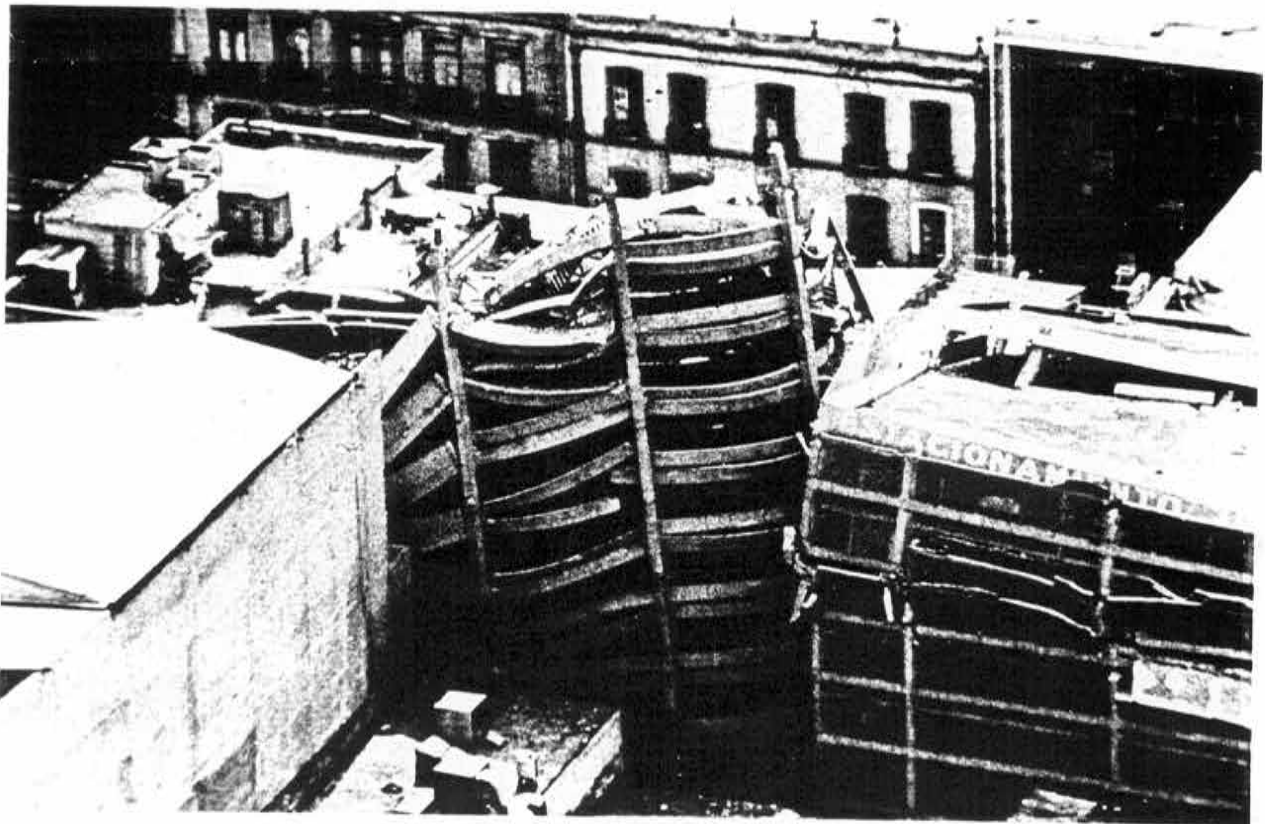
and 6.10c Top Storey Collapse and Collapse of Precast Concrete Parking Structure
